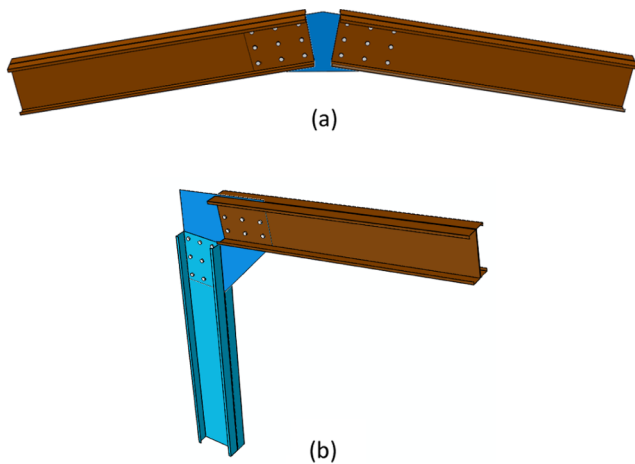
CFS (a) apex and (b) eaves connections with back-to-back beam sections used in typical portal frames.
